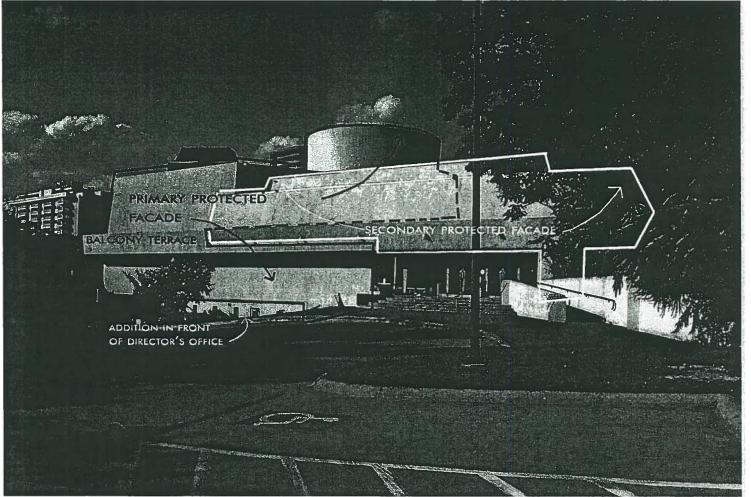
PROTECTED FACADES, SOUTHEAST
